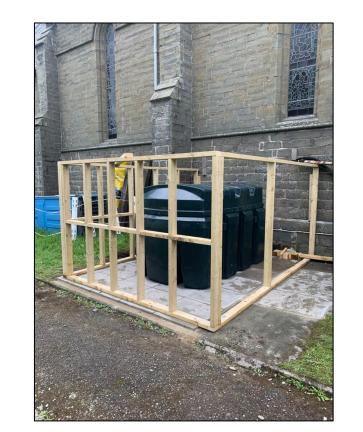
OST positioned on concrete slabs (17.08.20)
